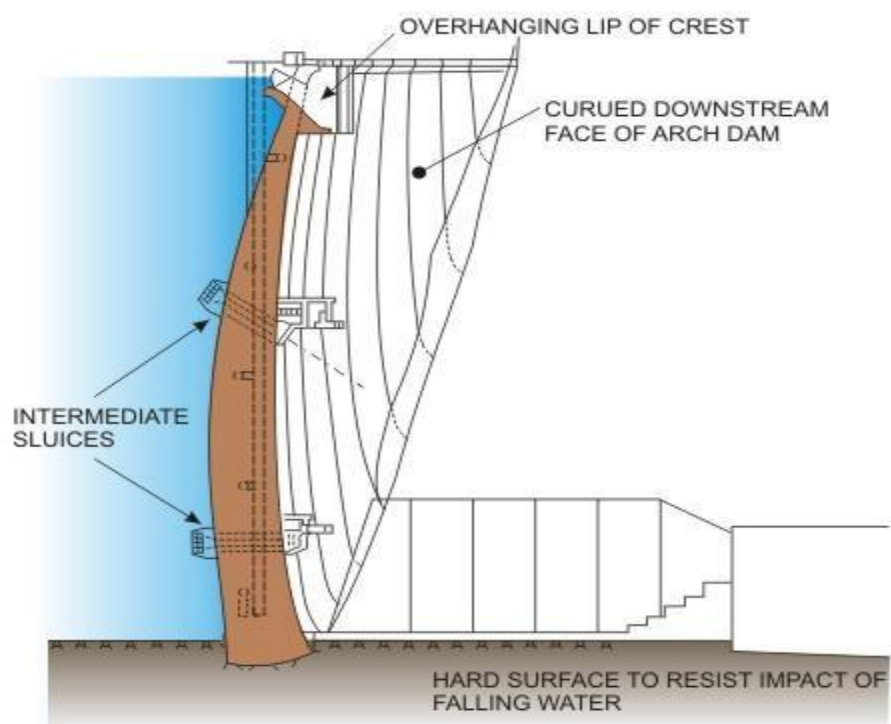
Short lip provided for overfall spilling of an arch dam
